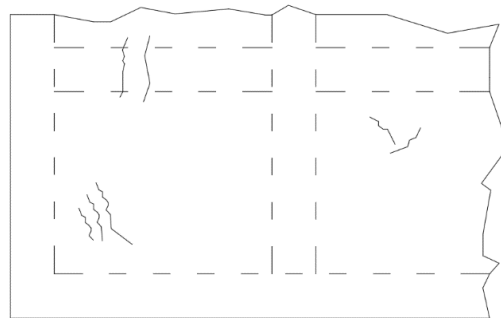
Cracks resulting from plastic shrinkage of concrete.
